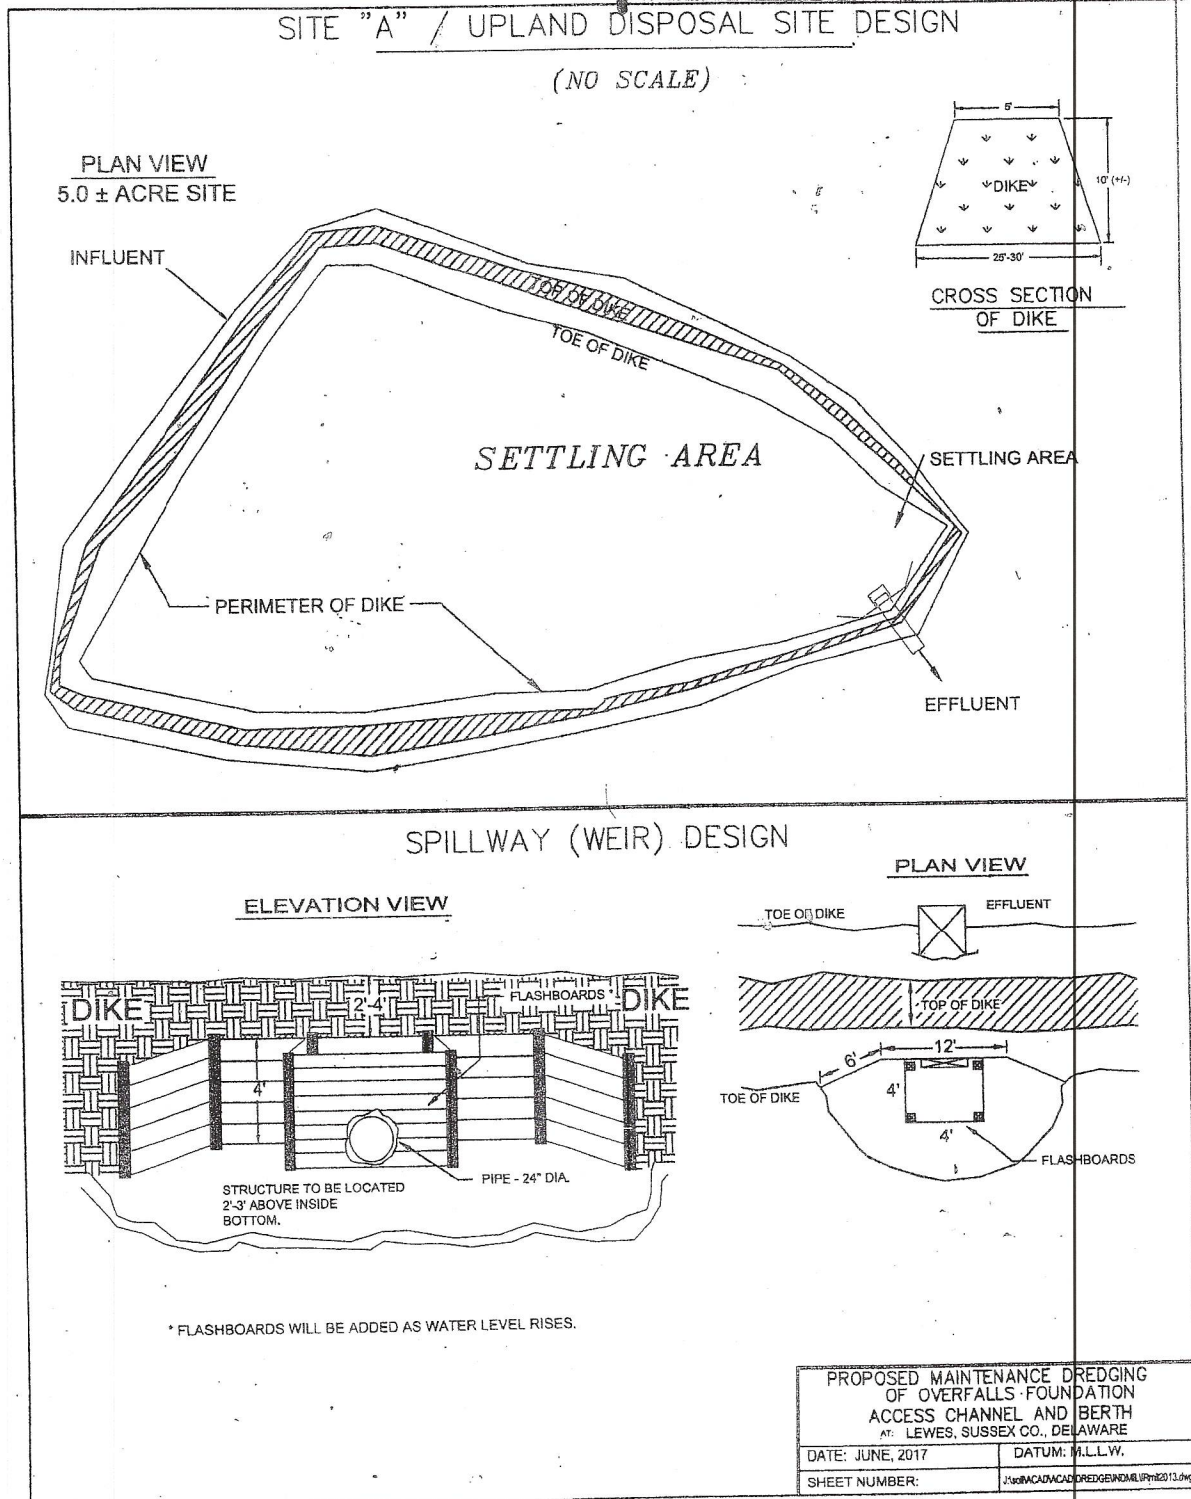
Confined upland disposal site plan and cross-section (provided by Chuck Williams, Shoreline and Waterway Management Section, DNREC).
